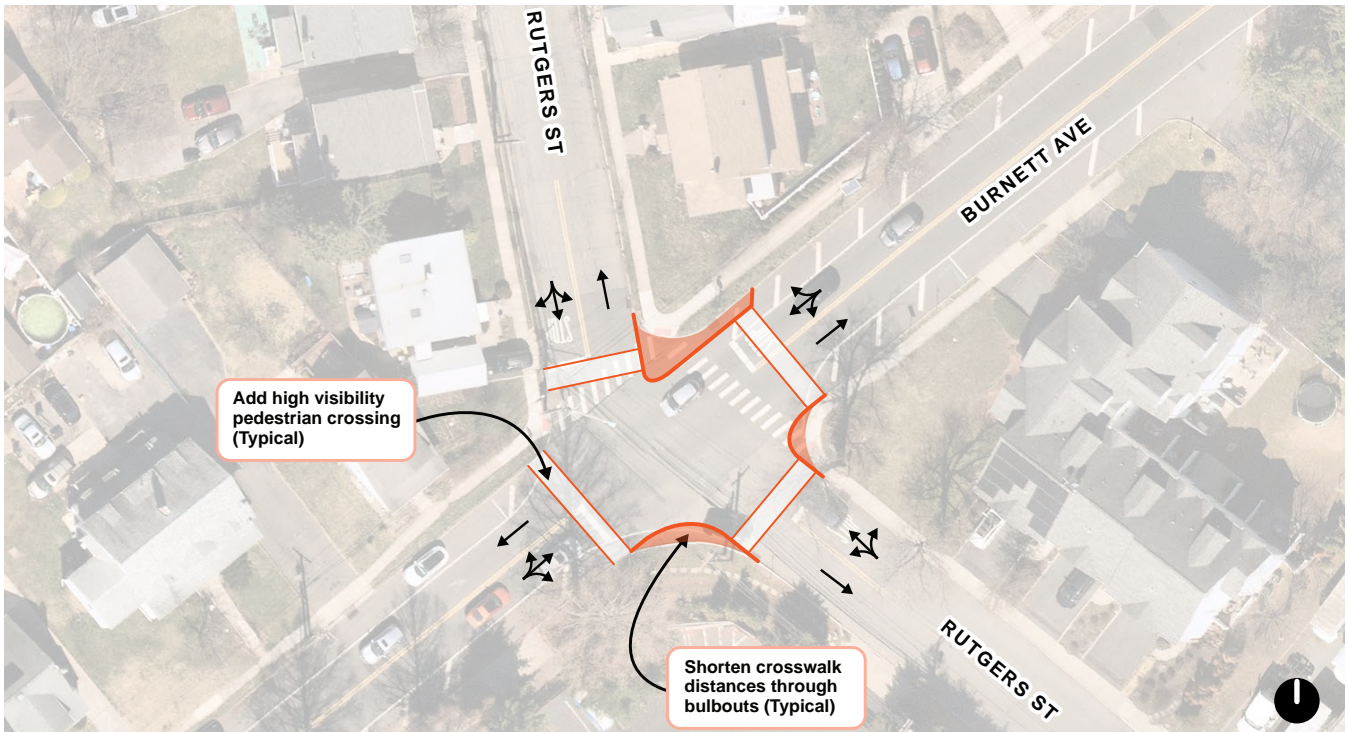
Conceptual Plan for the Intersection at Burnett Avenue and Rutgers Street
